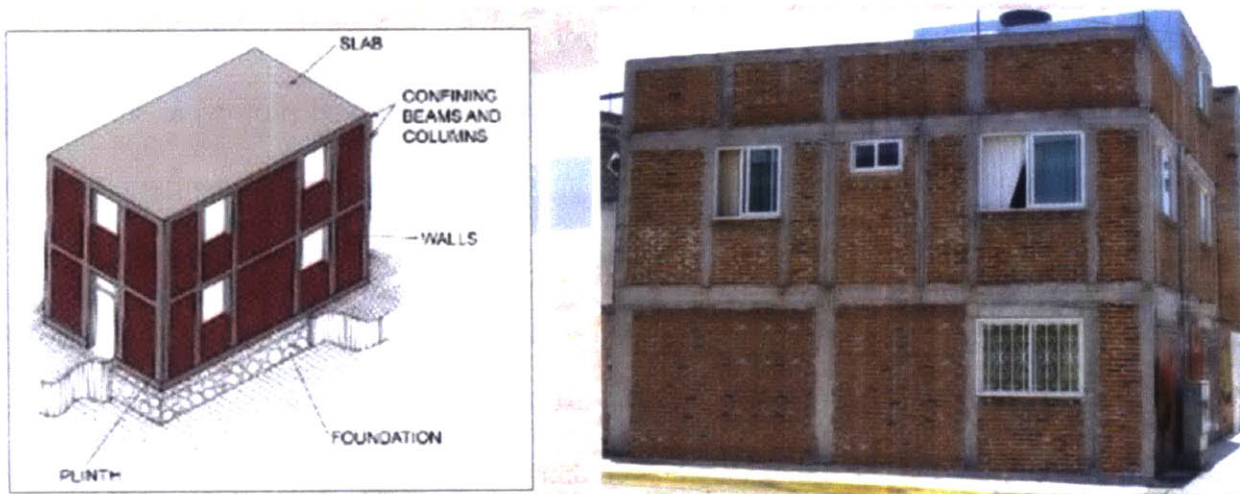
Key Components of a Confined Masonry Building (Meli et al., 2011)
